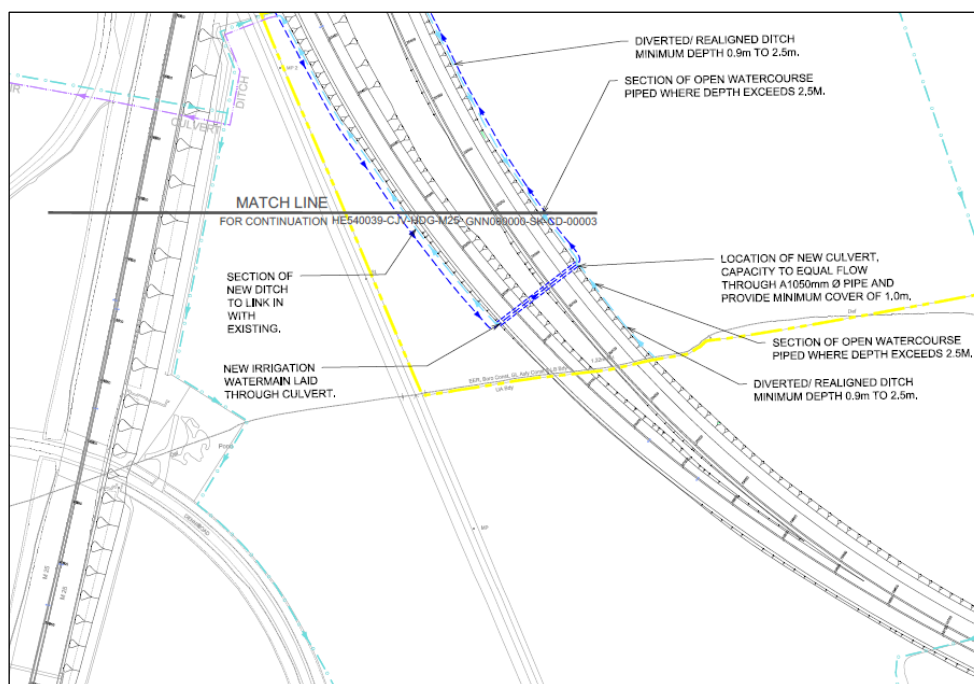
LTC plan showing proposed land drainage and irrigation solution
